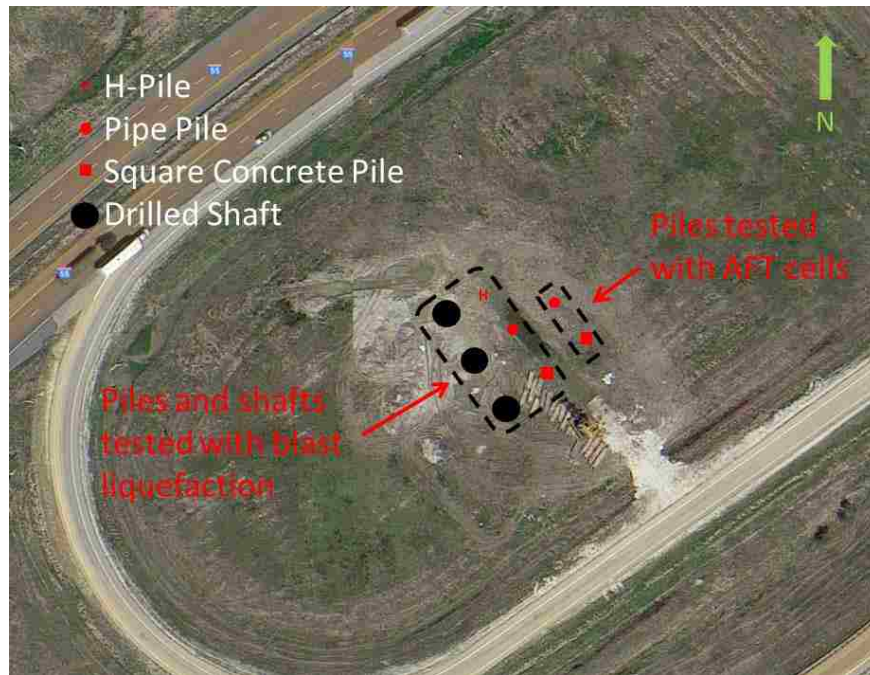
Approximate locations of the driven piles and drilled shafts at the Turrell Arkansas Test Site.
